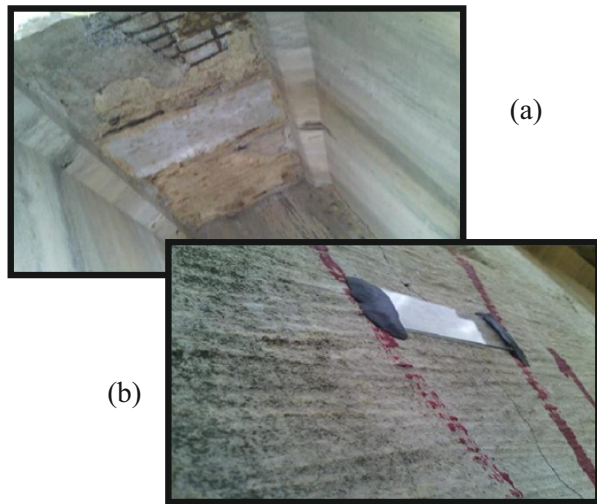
Deterioration of structural members of Ratlam Railway Bridge. (a) Cover delamination and corroded reinforcement exposure observed in deck slab bottom (b) Severe cracks seen in girder.
